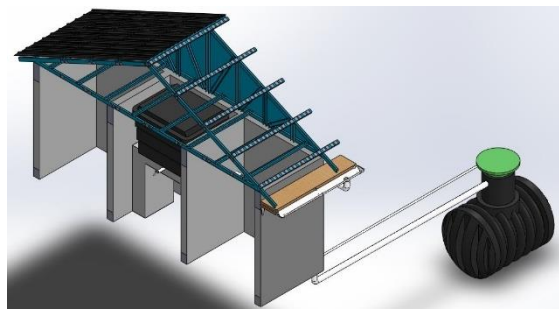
Section View of a Building after Implementing the Indirect Pumped System.
